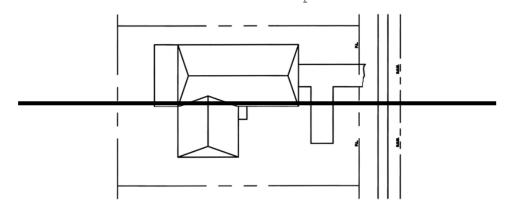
D. Two spaces with 9' × 36' driveway extension.
